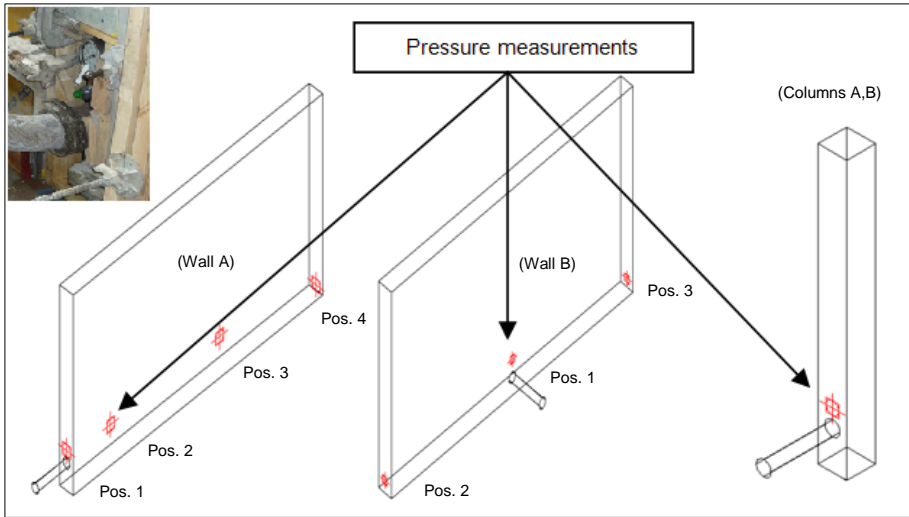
Connections of the SCC inlet for the walls and for the columns.
